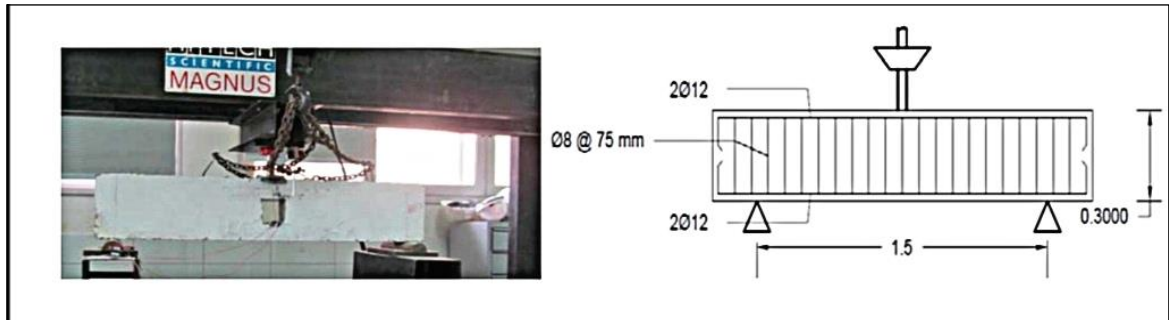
The beam test setup and the steel reinforcement configuration[69].
